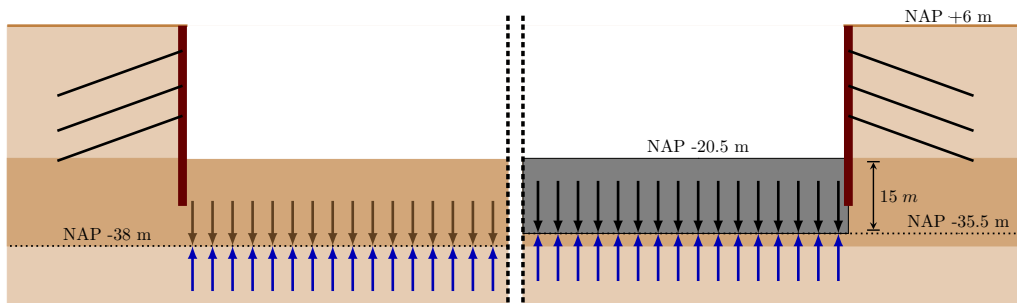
Forces on the Boom Clay layer (left) and underwater concrete floor (right)
